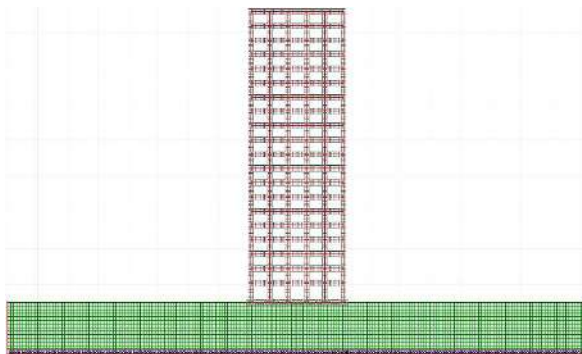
Building, soil layer and foundation modeled in FLAC nonlinear platform
